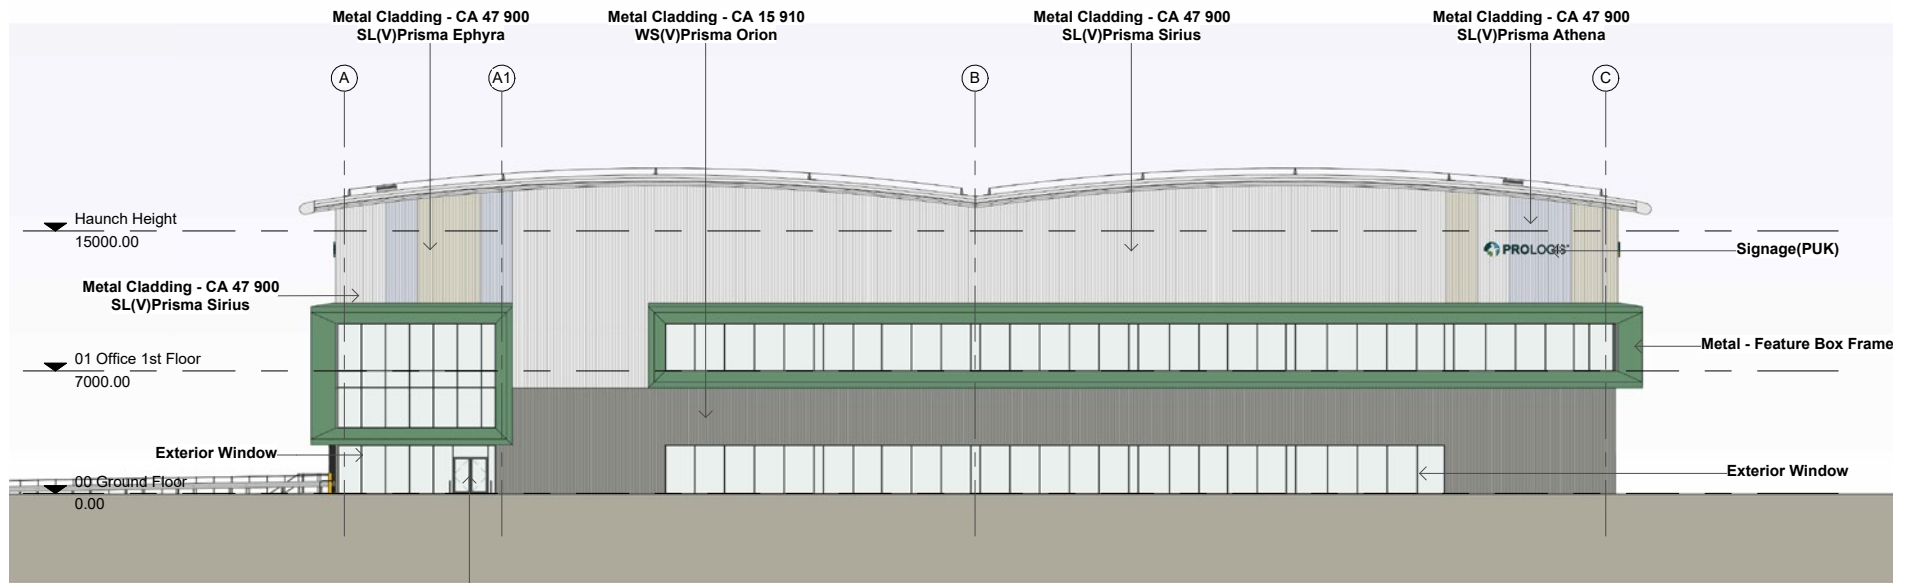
DC8 (ZONE D) - ELEVATION SHOWING FEATURE CLADDING
